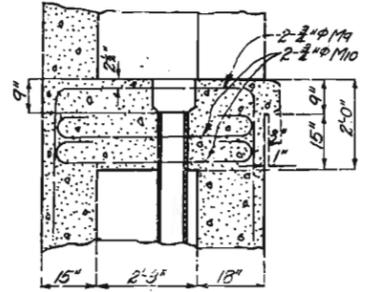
DETAILS OF BENT OVER ABUTMENTS NO. 2 & NO. 7
